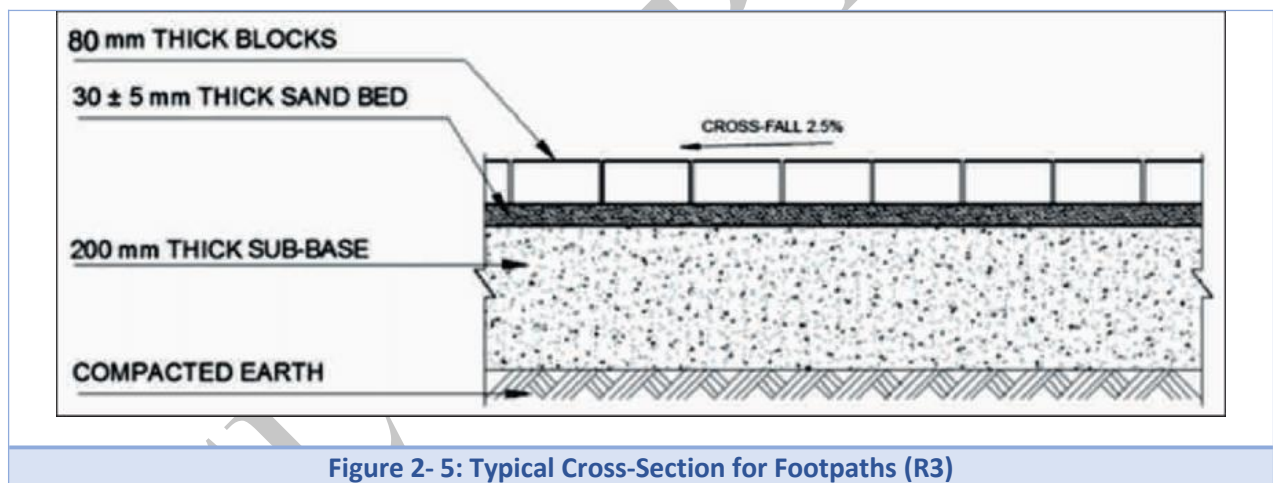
5: Typical Cross-Section for Footpaths (R3)
